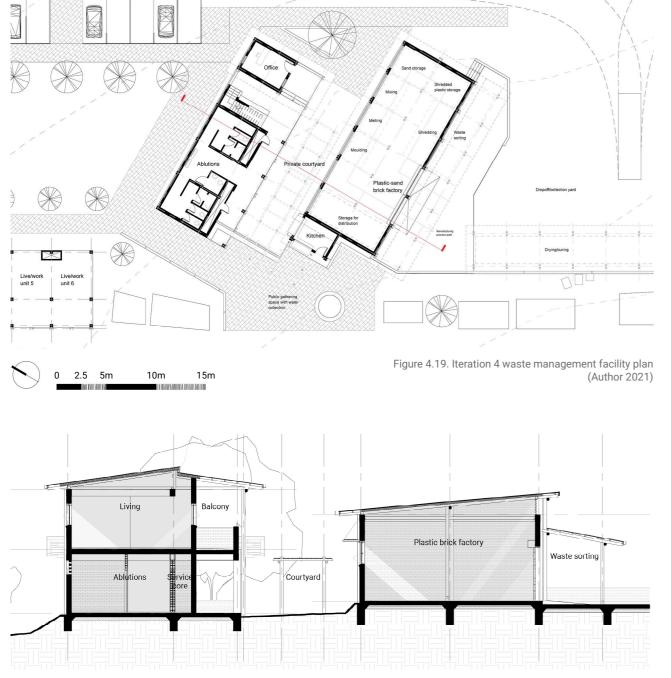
Iteration 4 waste management facility section (Author 2021) Design development
